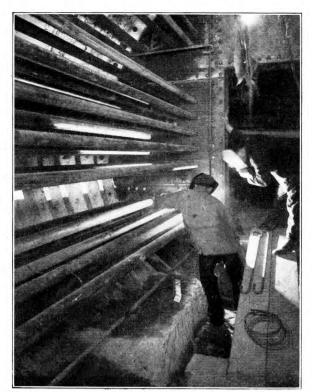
Cable Pipes being Welded to Main Plate of Bulkhead.
